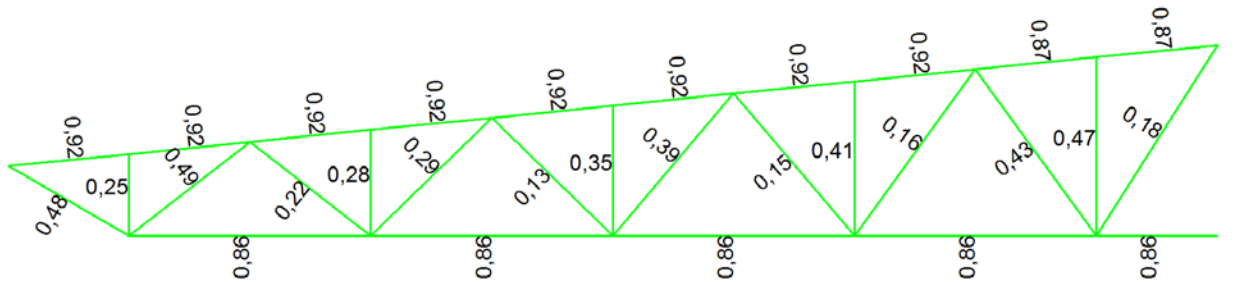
Elements efficiency in 30 meters span truss elements with 1.7 tnf/m loading
